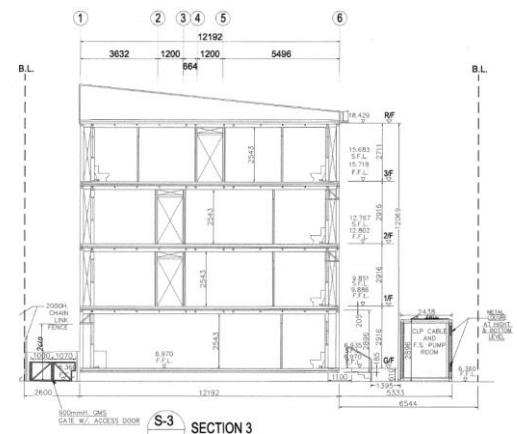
NC220 exterior and module layout*; floor plans and section#.)
